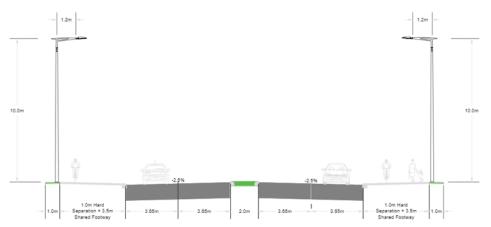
NDC standard cross-section (40 mph) and typical lighting columns
